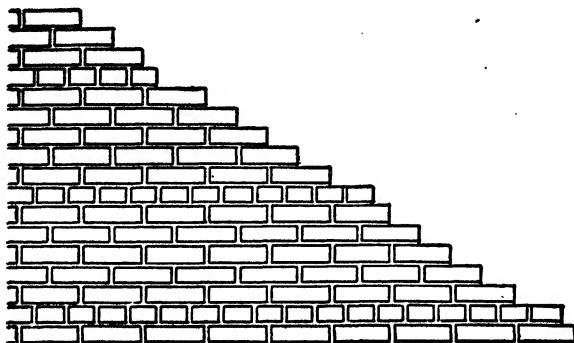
Incompleted wall sections should be stopped in manner shown here.
